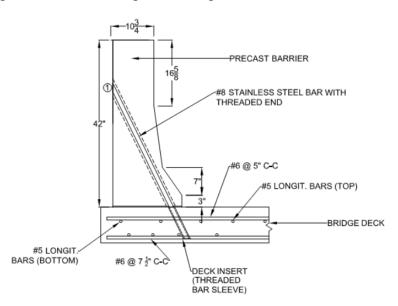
Iowa State University Inclined Bar Connection Between Precast Barrier and Deck (all dimensions are in inches) [1]
